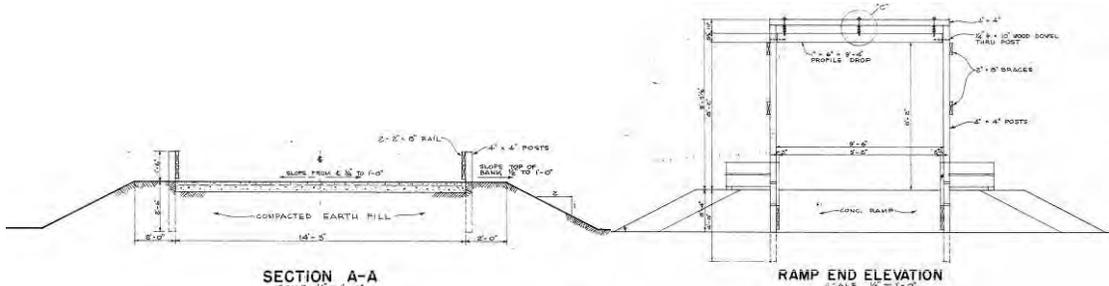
C-123 concrete mock-up for air movement training, ramp section a and end elevation, Fort Bragg, NC, 1951 (standard drawing 28-13-57a sheet 1 of 1; C-123 mock-up for air movement training, concrete alternate, slab on fill; 7 December 1951).
